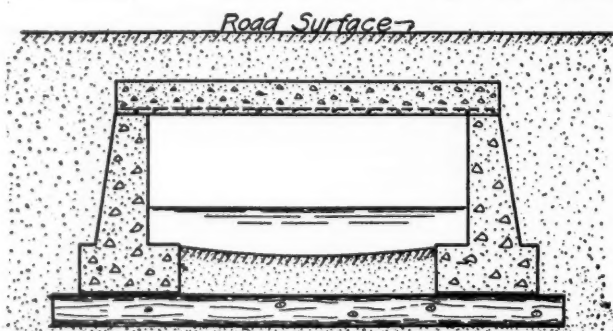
CULVERT WITH LOGS IN FOUNDATION.
